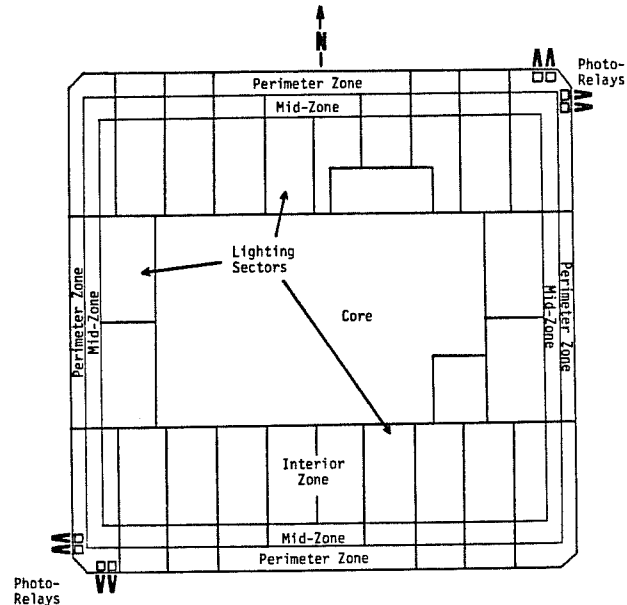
Floor plan of 58th floor World Trade Center showing 1000 square foot lighting sectors and daylighting zones.
